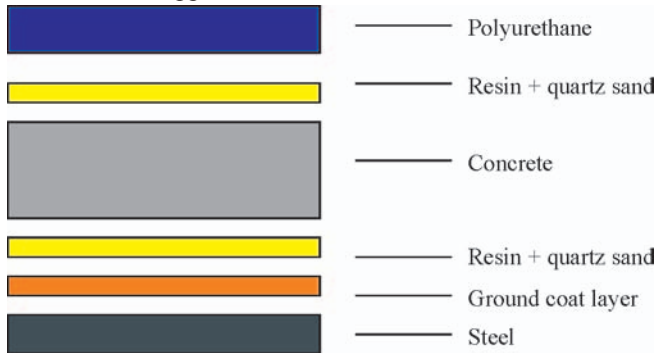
Layer structure of the typical elastic barrier supported by light concrete core
